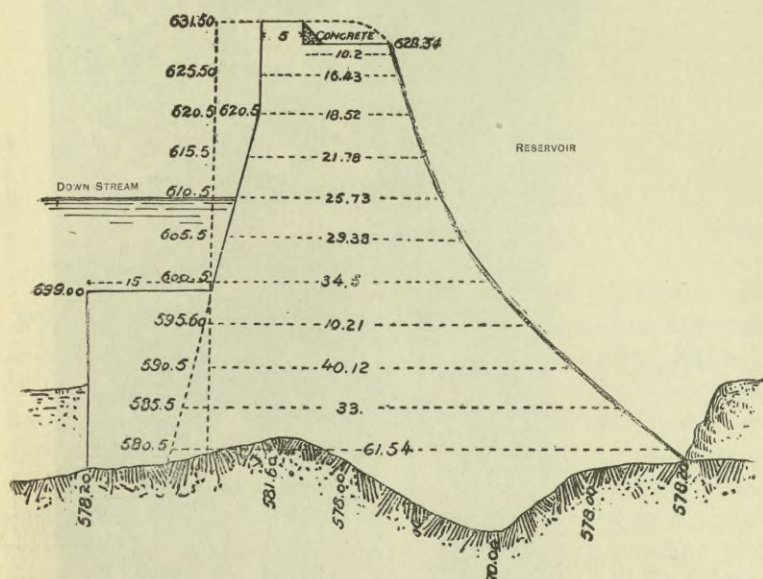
CROSS-SECTION OF BETWA DAM, INDIA.
